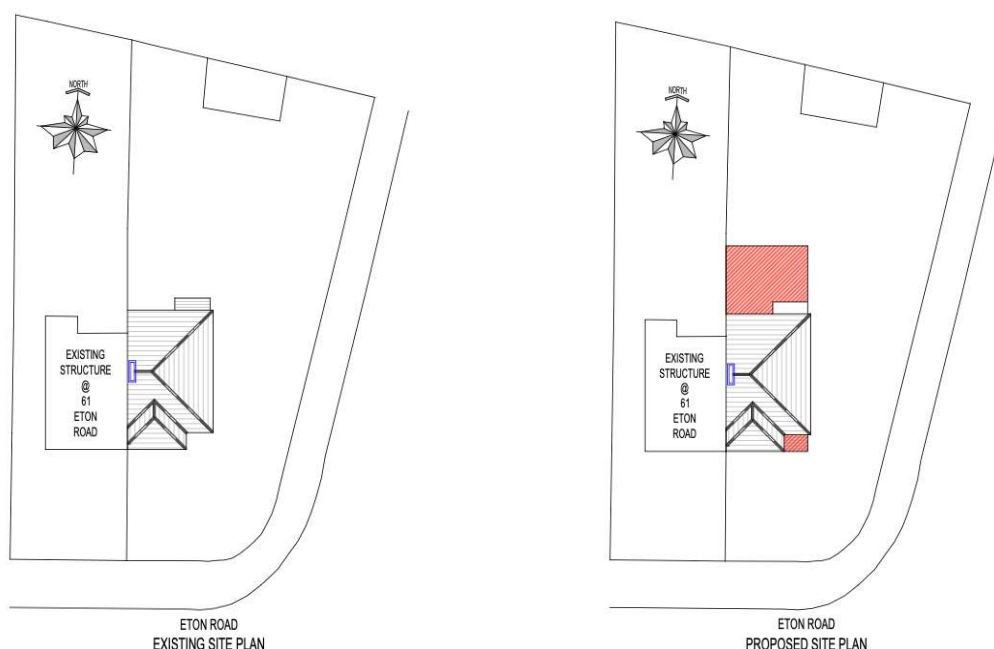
EXISTING AND PROPOSED SITE PLAN
